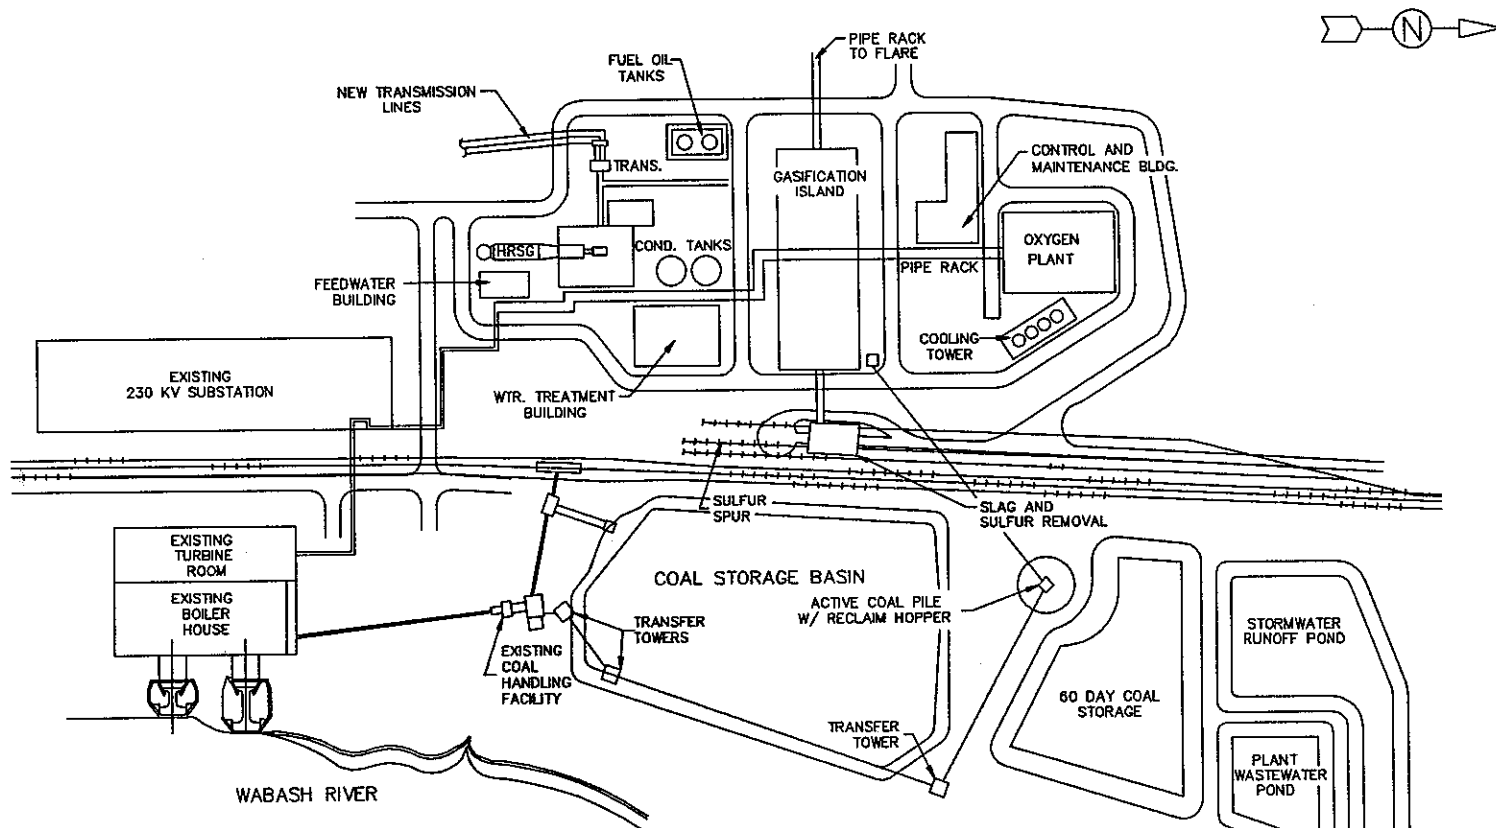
Wabash River Coal Gasification Repowering Project Site
